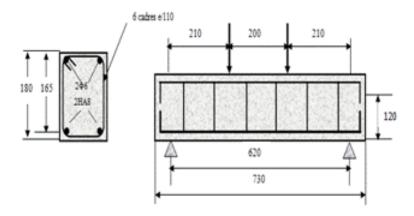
Schematic layout of the specimen and steel reinforcement in accordance with ASTM 78-00.
